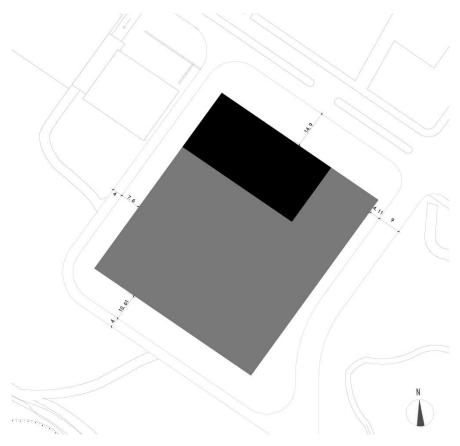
Site Plan. Building Footprint Area =  $1326 \text{ m}^2$
